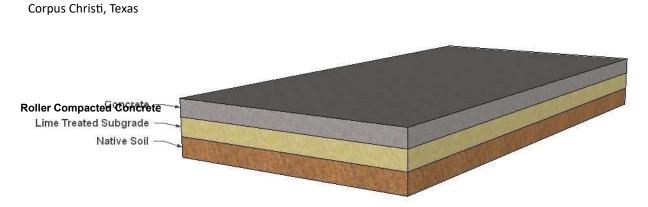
ROLLER COMPACTED CONCRETE PAVEMENT TYPICAL SECTION
